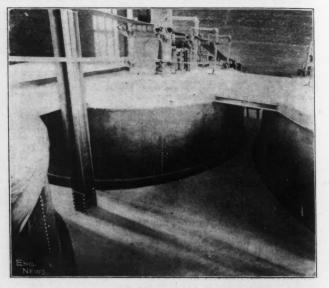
INTERIOR VIEW OF THE NEW YORK SUGAR REFINING CO.'S NEW REFINERY, SHOWING MANNER IN WHICH CONCRETE FLOORS WERE CUT FOR LARGE TANKS.
